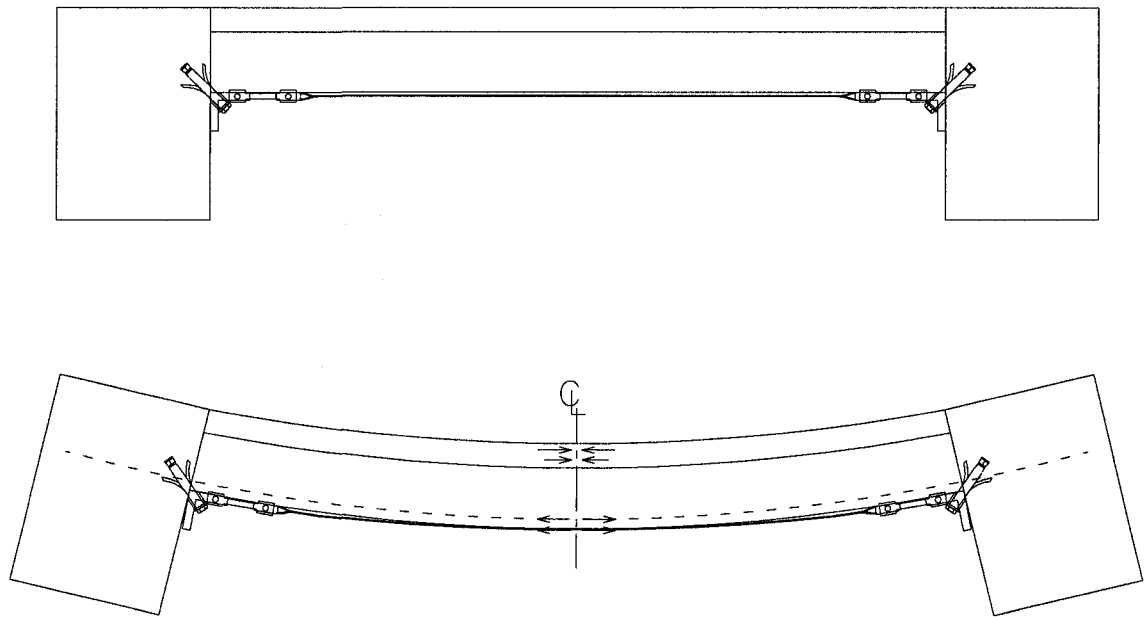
Behaviour of beams strengthened with the proposed hybrid FRP / ductile steel anchor system
